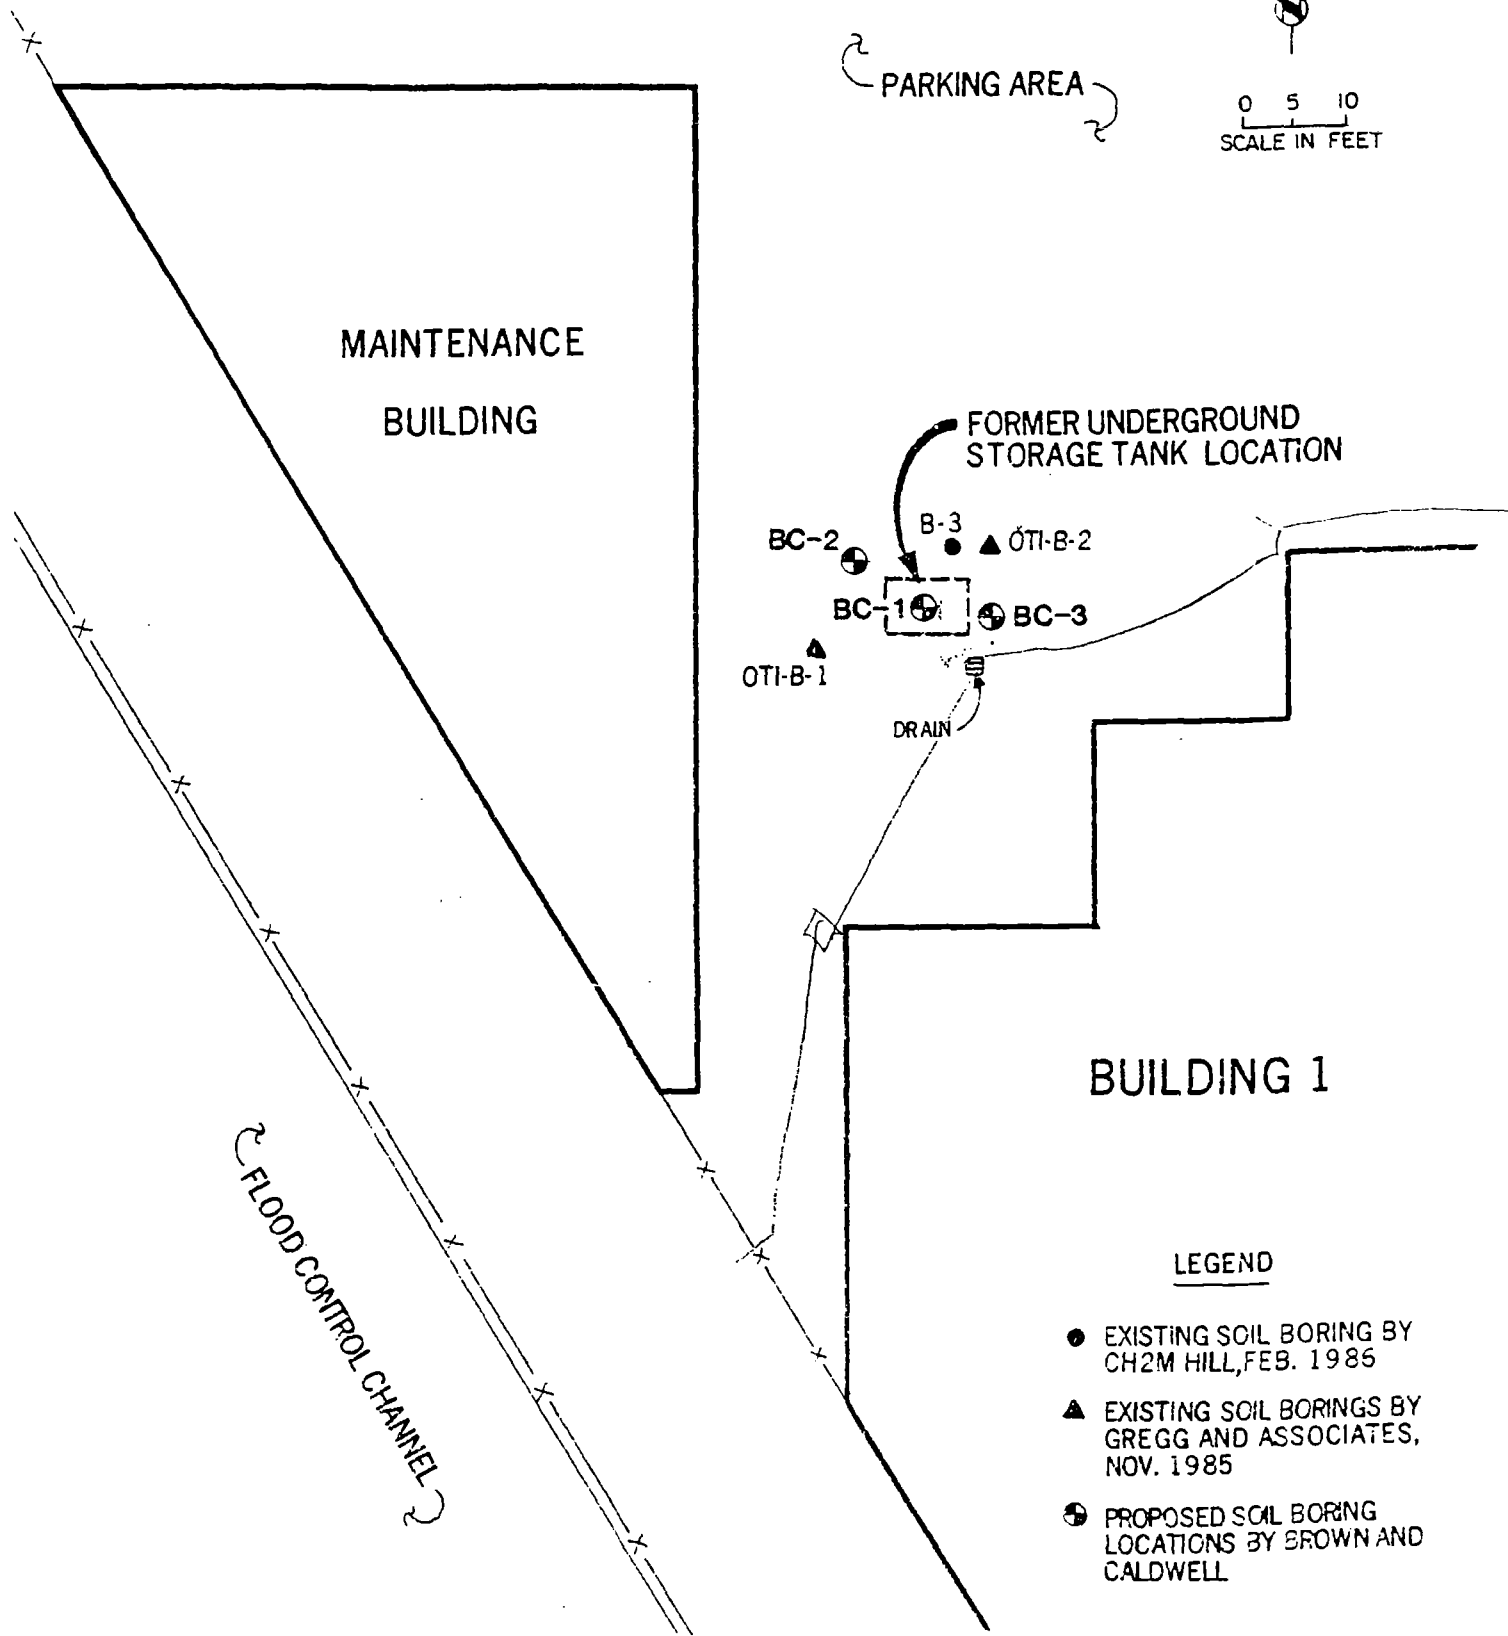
Underground Storage Tank Location and Proposed Soil Boring Locations
